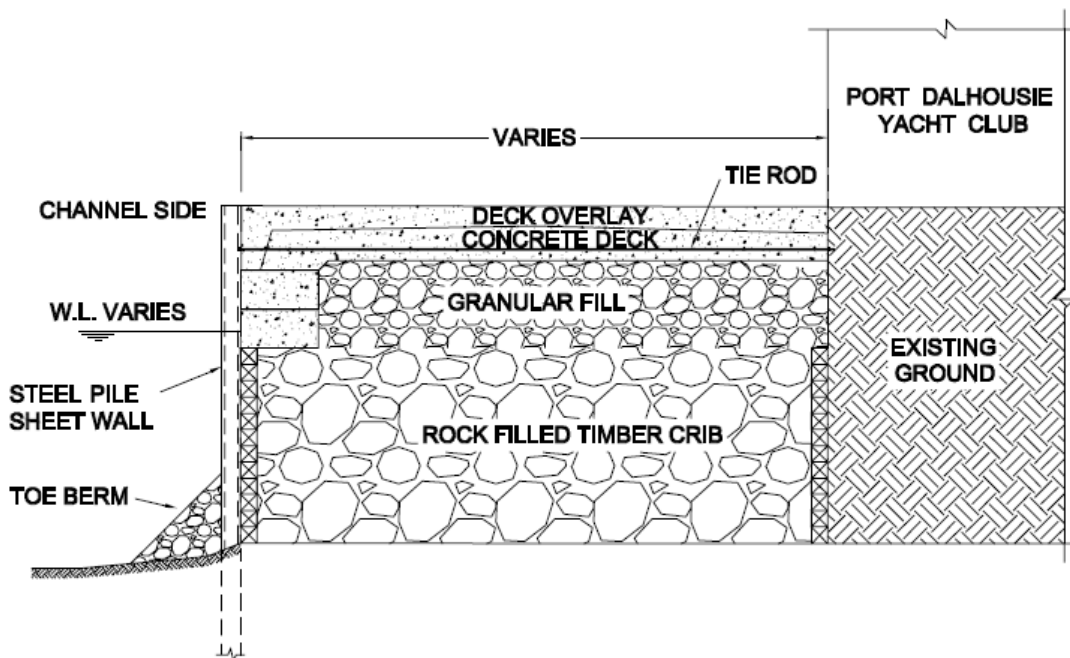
Typical Section at the Dalhousie Yacht Club Wall (#406)
